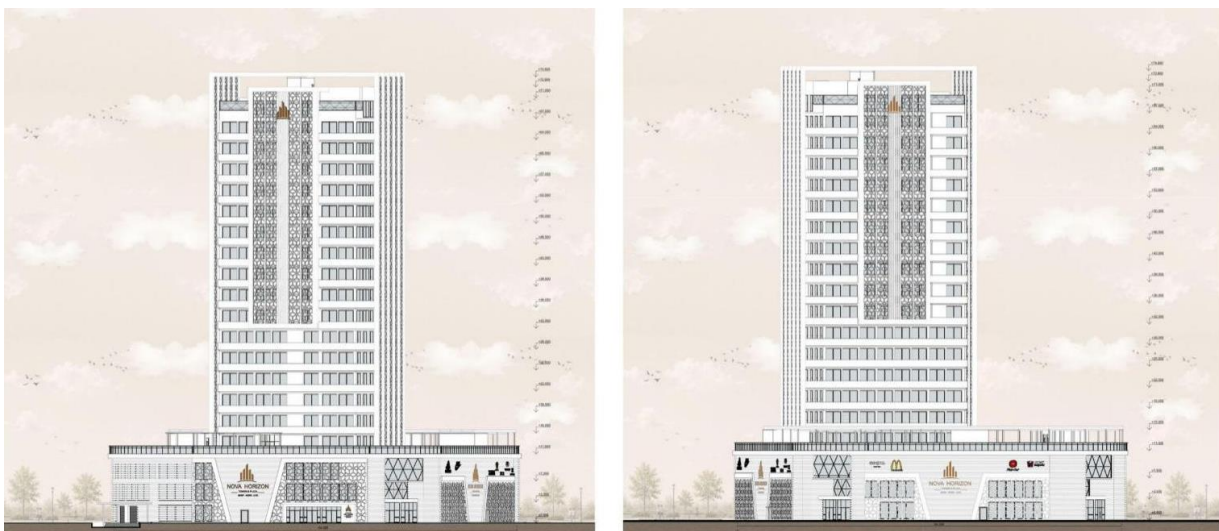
Elevations A-J (left) and J-A (right) of the Mixed-Use Building
